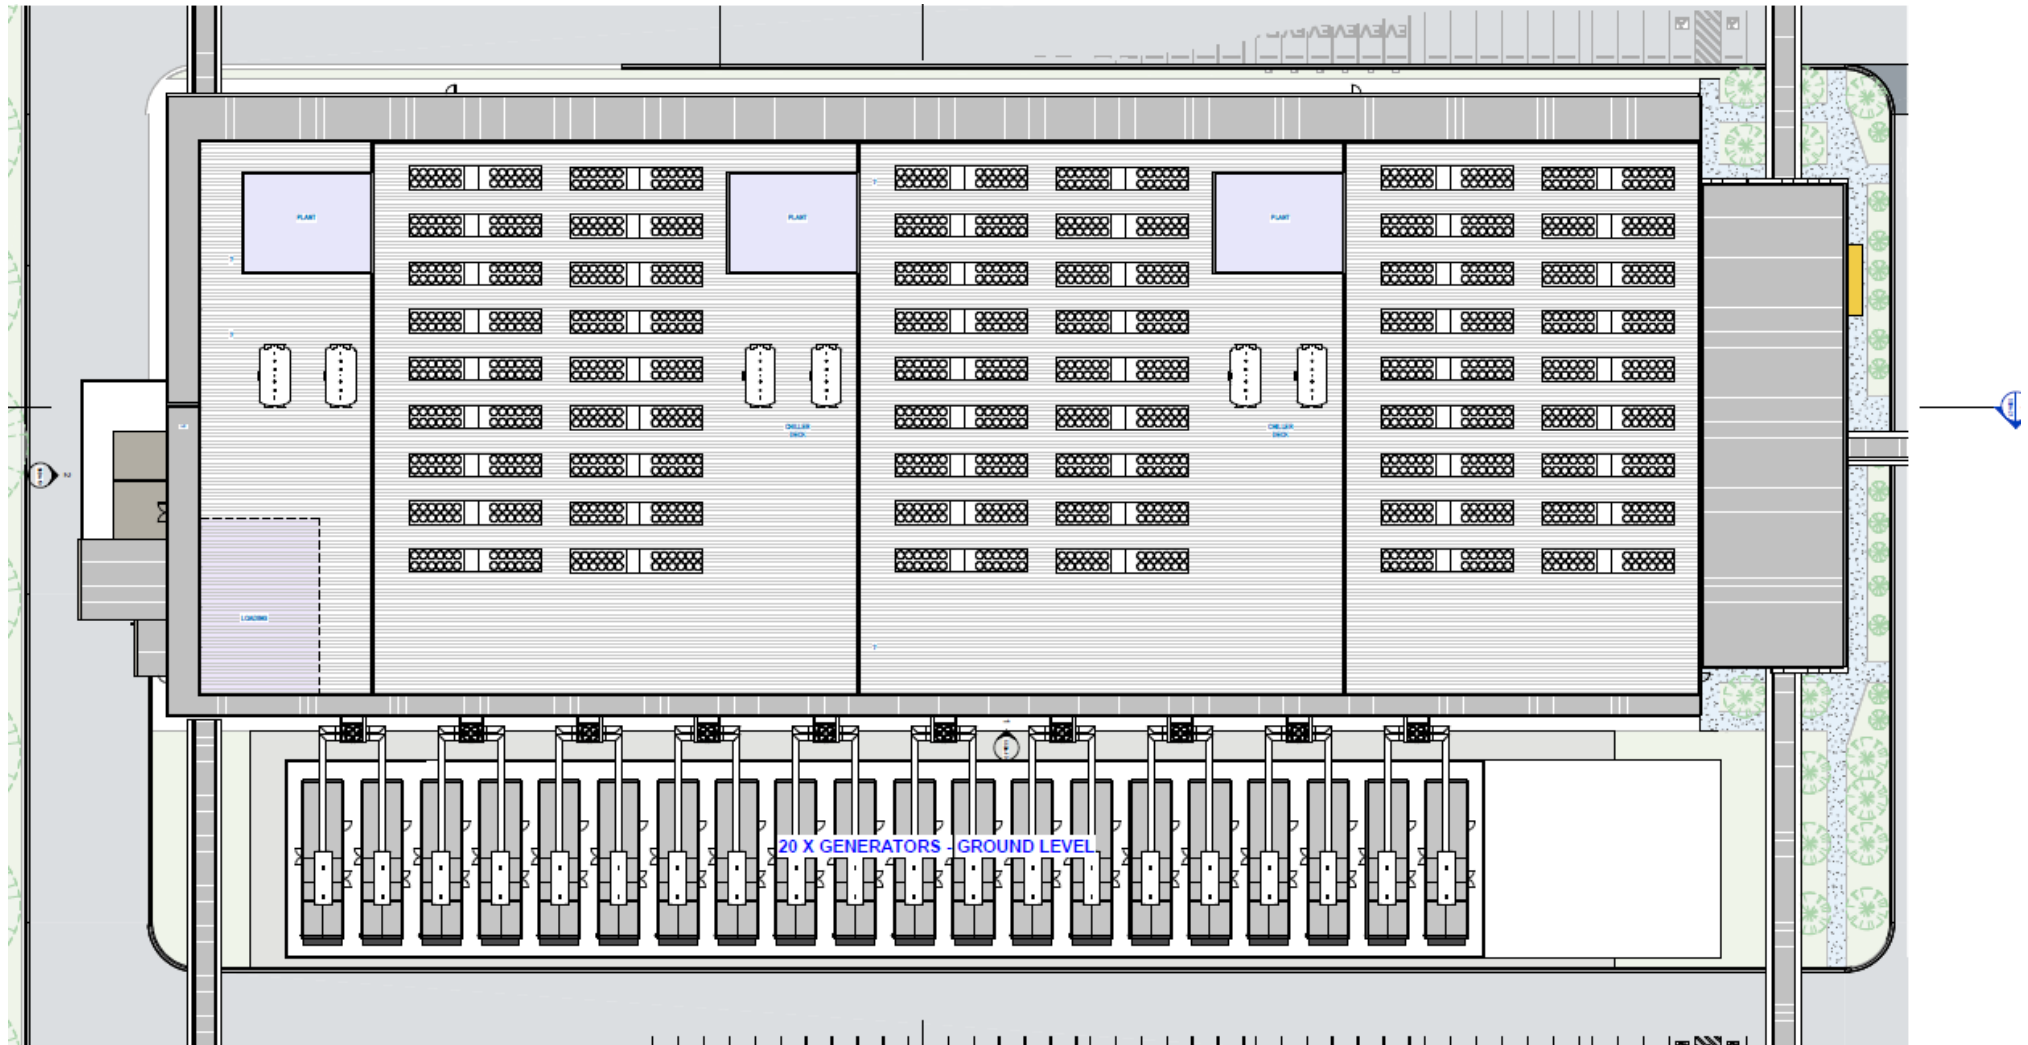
Typical 84MW Data Centre - Chiller Deck Level Floor Plan
